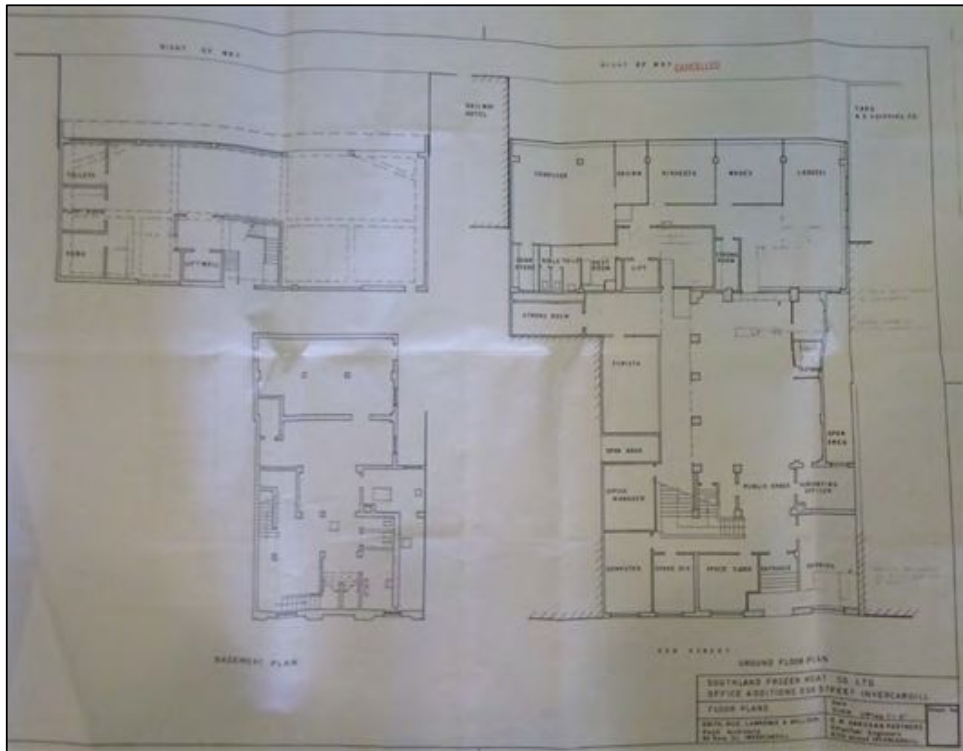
Plans showing 1965 extension of 8 Esk Street.
